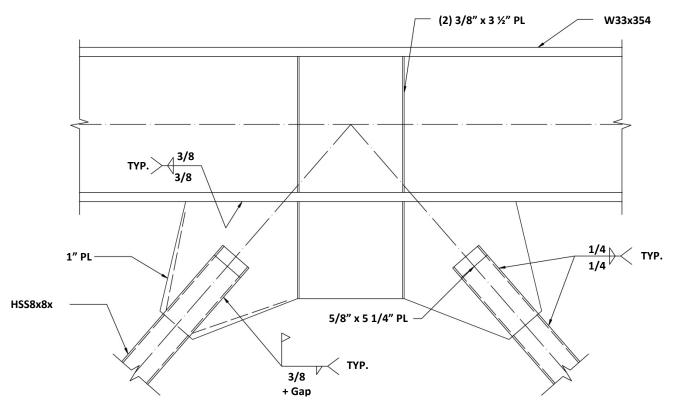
Designed Chevron SCBF Brace to Beam Connection
